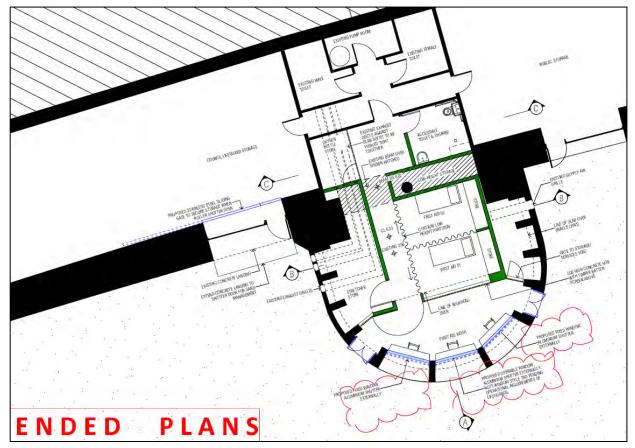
Approved plan of First Aid Facilities and Tunnel 3.
